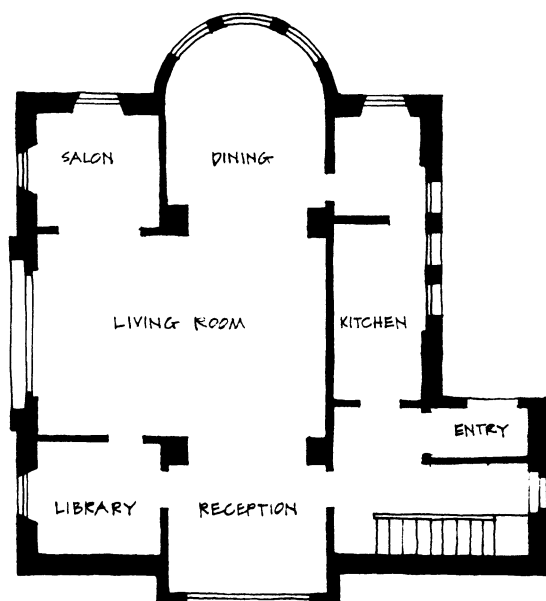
Jeanneret, plan for Jeanneret House (Redrawn by author).
